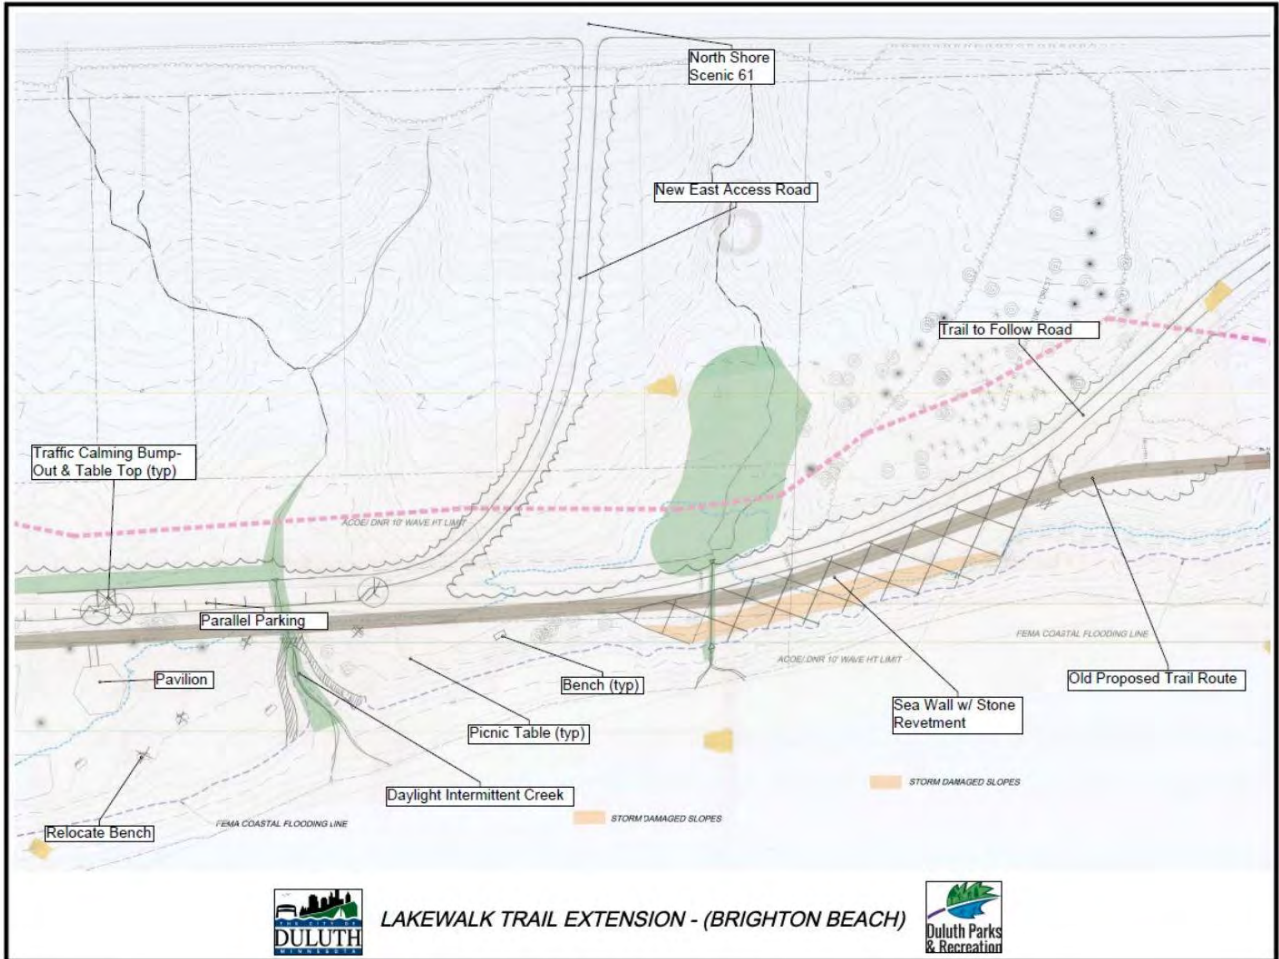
Preliminary proposed landscape and amenity plan, view of Kitchi Gammi Park and Brighton Beach, with new shoreline revetment, pavilion, parking, and other amenities.
